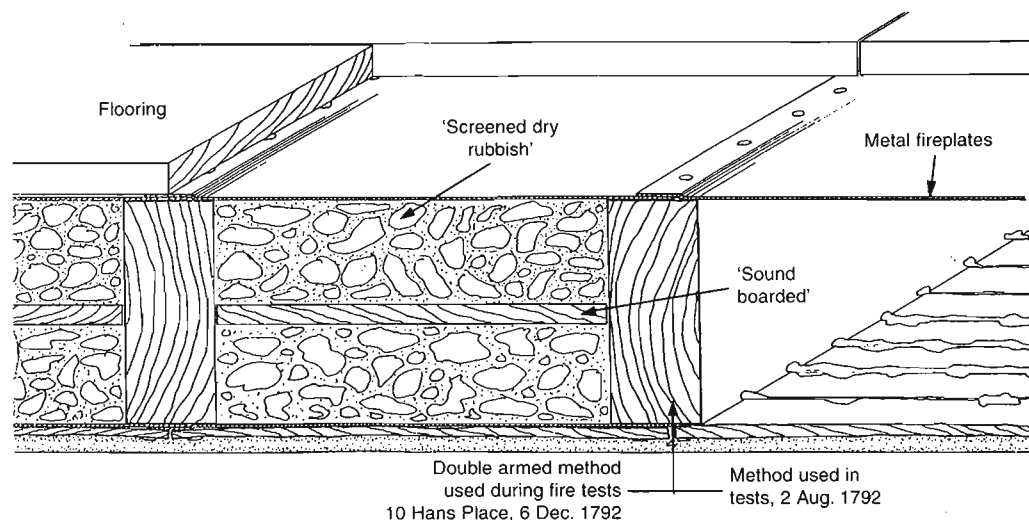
Sections through timber floor fireproofed with Hartley's fire plates, as patented and generally found, and as tested with double plates reinforced by pugging
